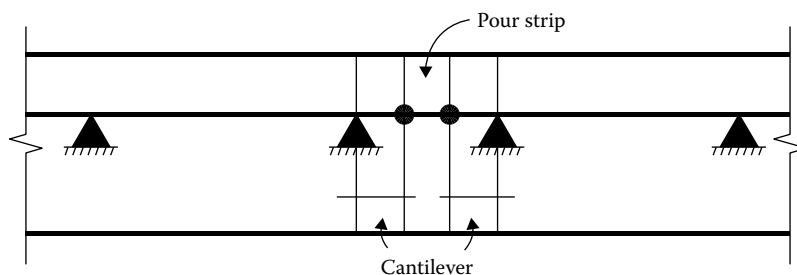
Pour strip as a simple span supported by cantilevers.
